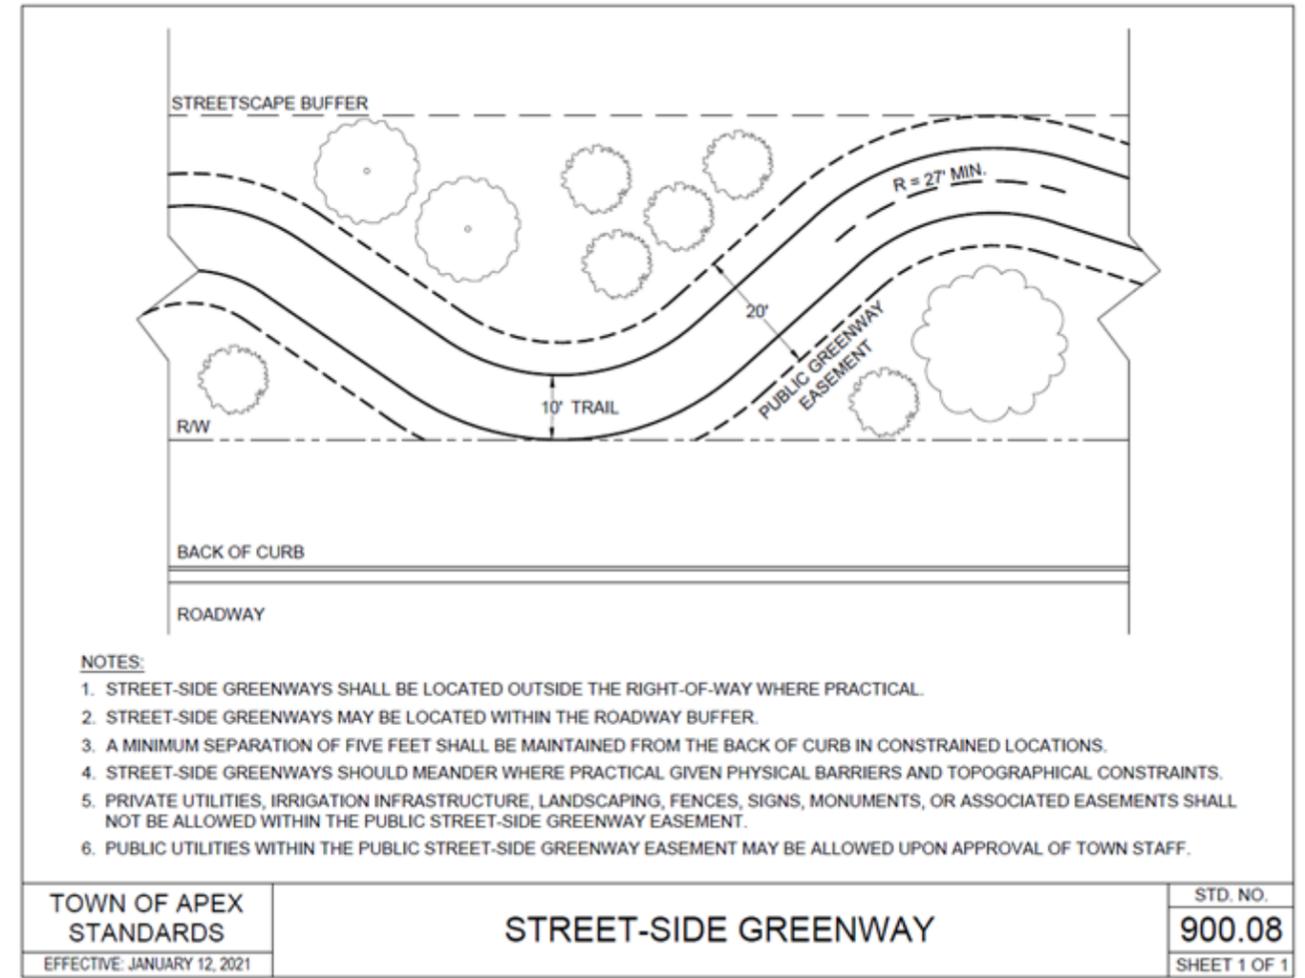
Existing Design Standard for Street-Side Greenways / Town of Apex
